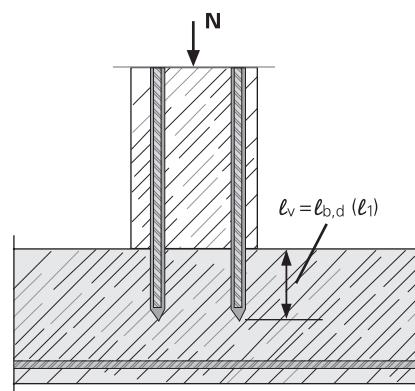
Rebar connection for components stressed primarily in compression. The rebars are stressed in compression.
